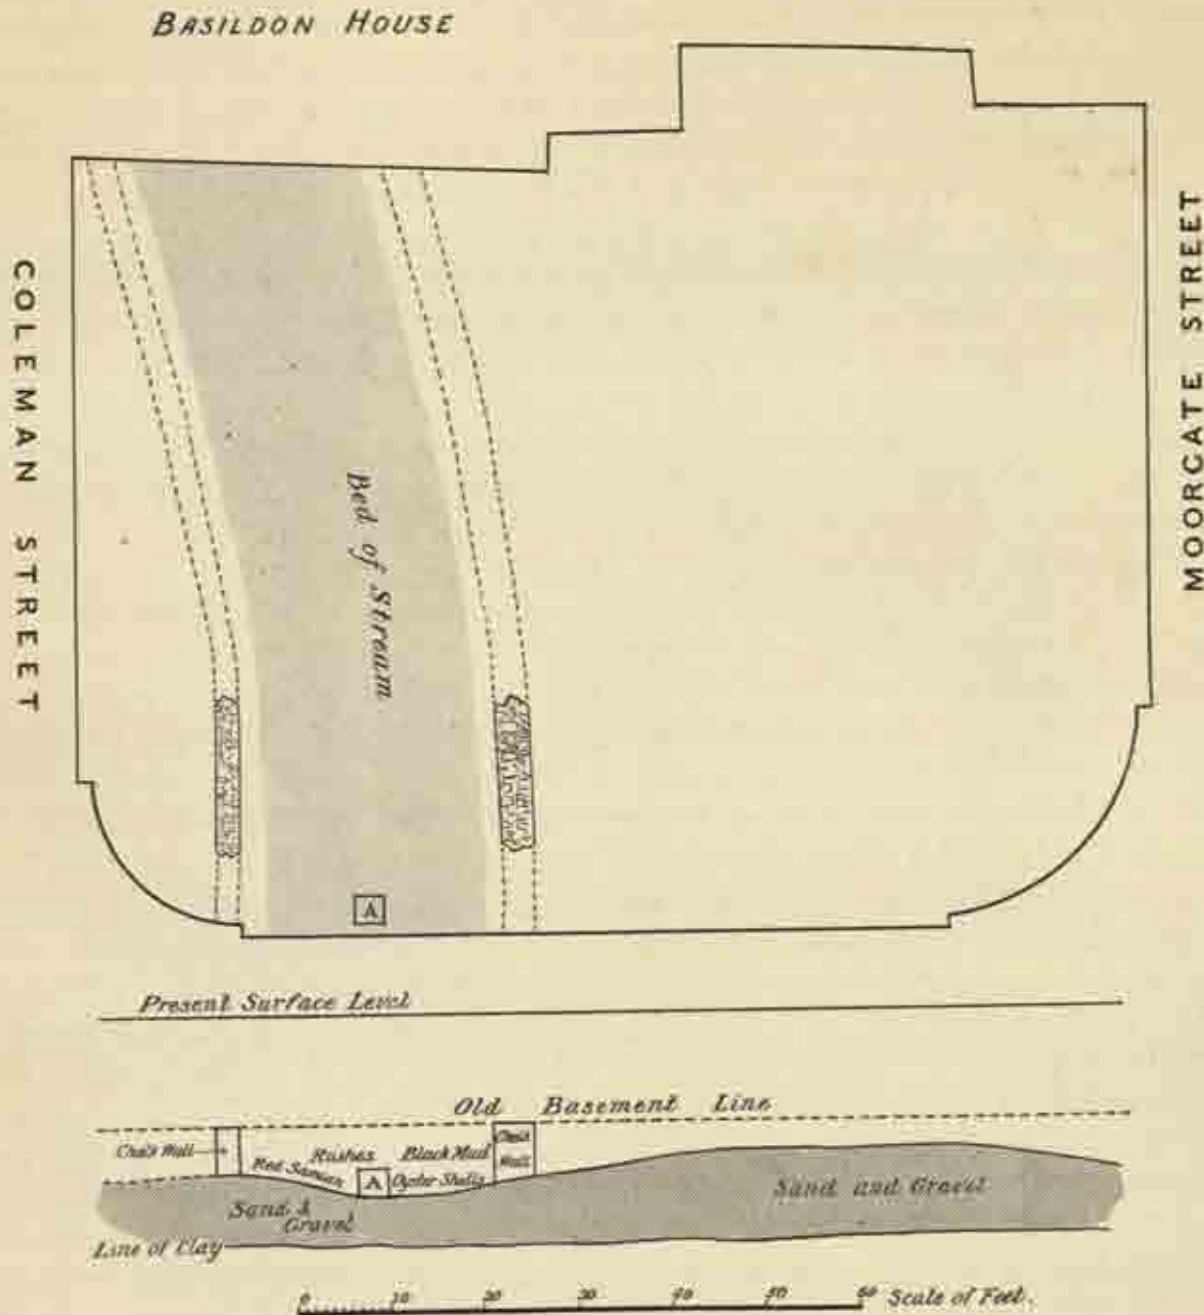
Plan and section of the site of the Northern Assurance Offices.
